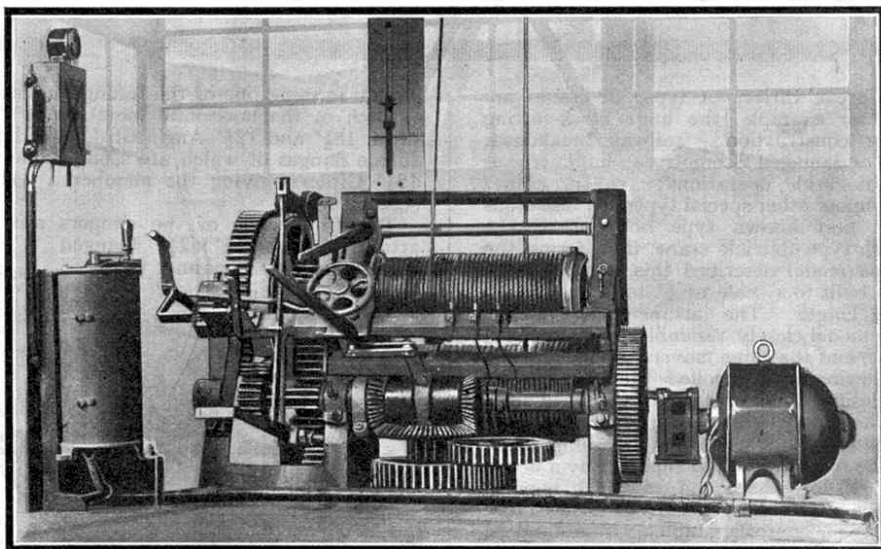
Interior of the operating cab of an actual Derrick showing gears and motor. The electric motor controller can be seen on the right.
